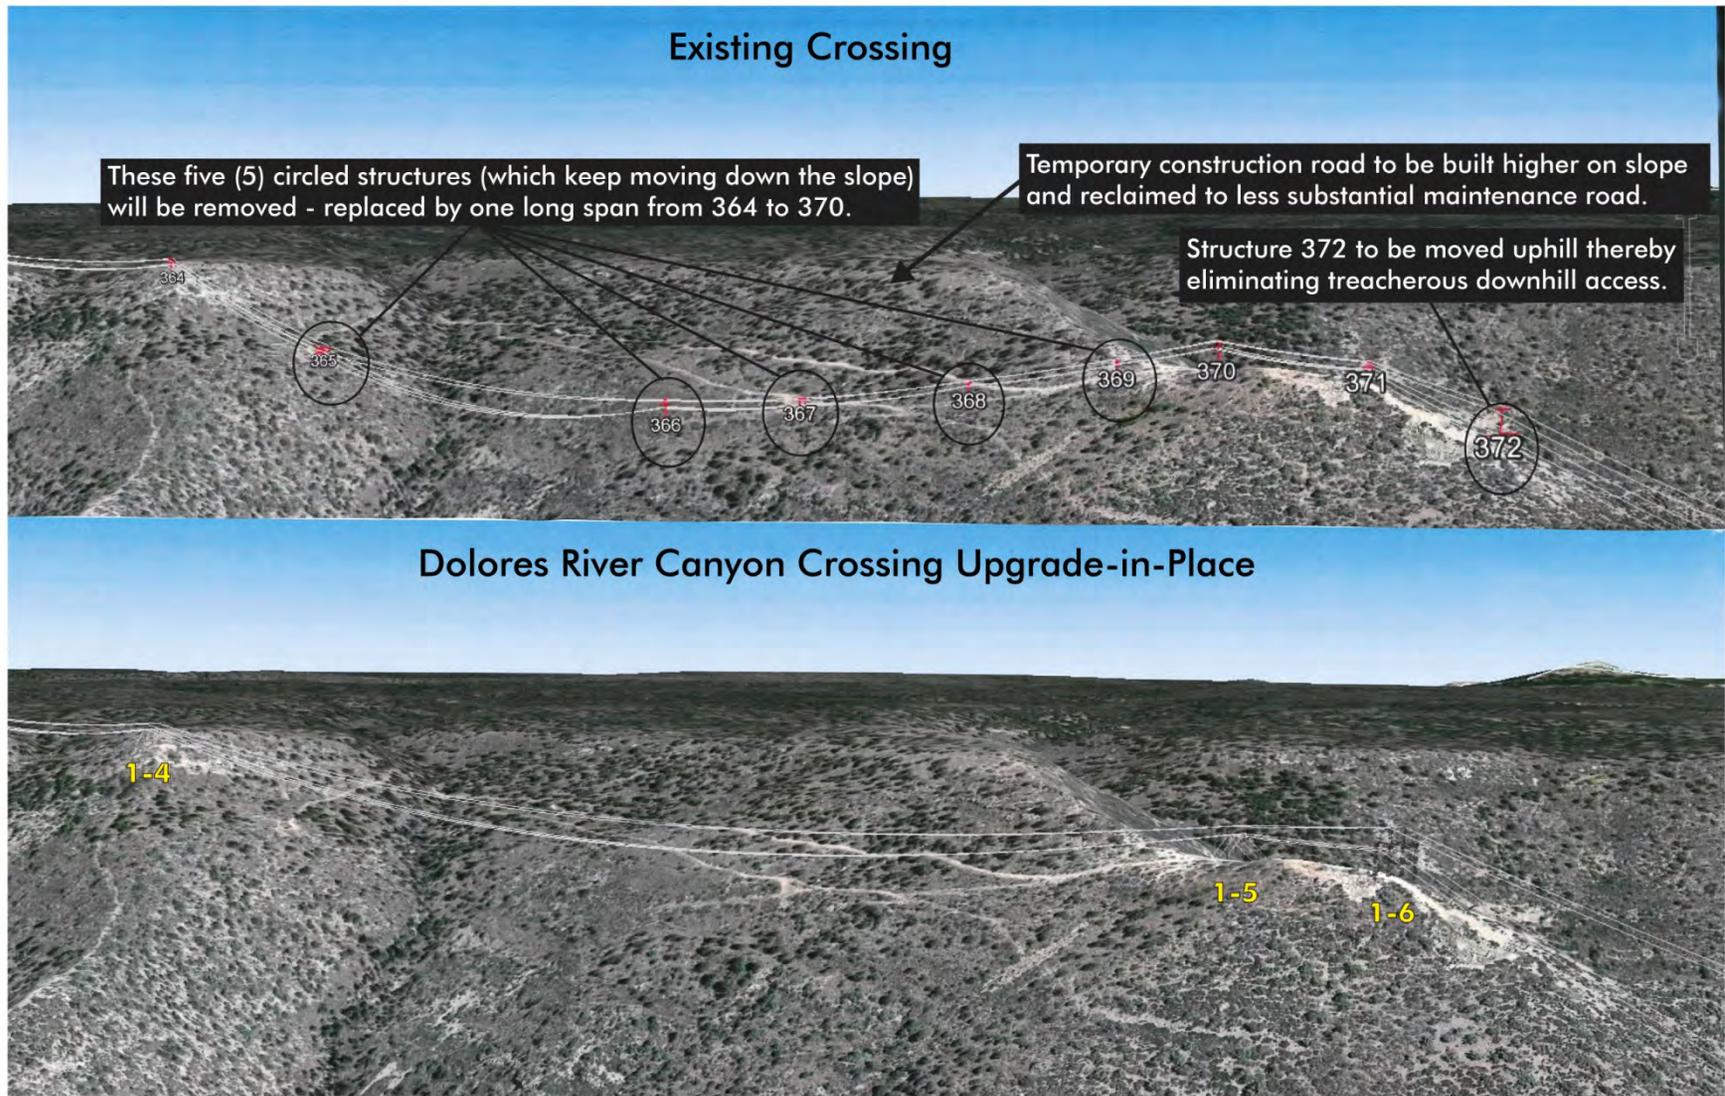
Dolores River Crossing Secondary Span Compared with Existing
